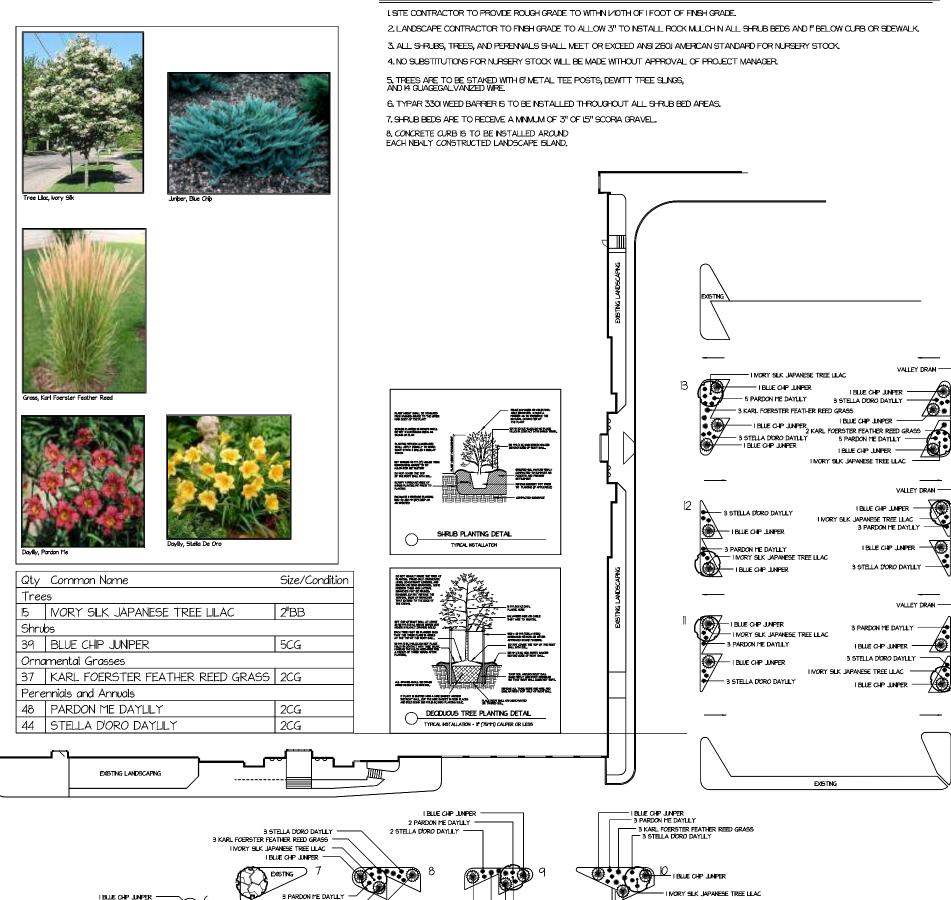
EXHIBIT E - PARKING LOT LANDSCAPING PLAN
